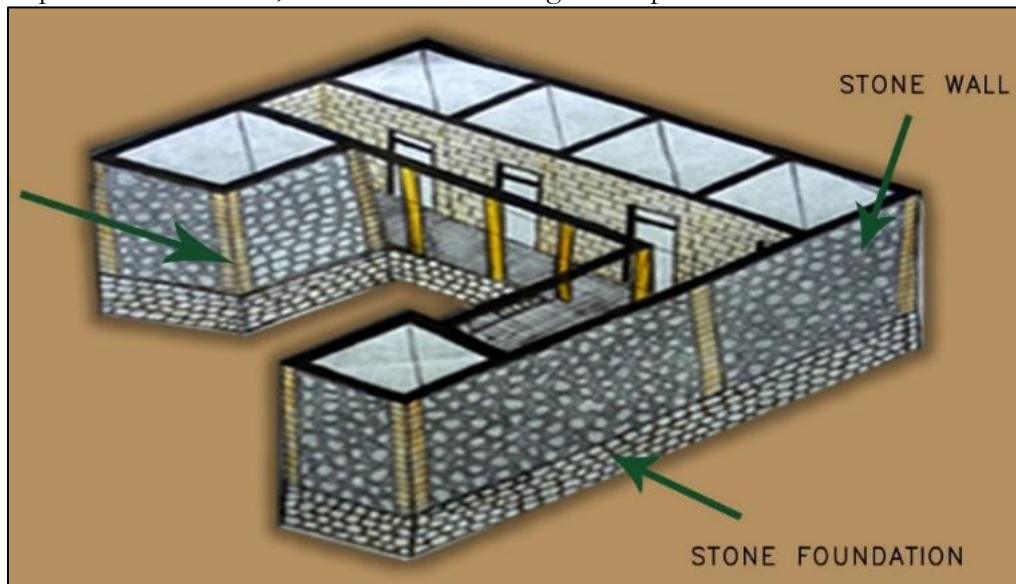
3D-view highlighting the placement of wood as a structural element.
